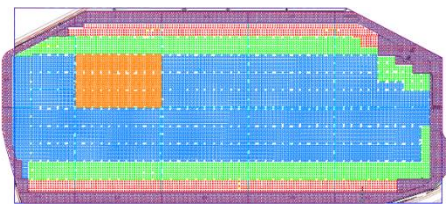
Schematic plan with the ground improvement solutions (not to scale).
